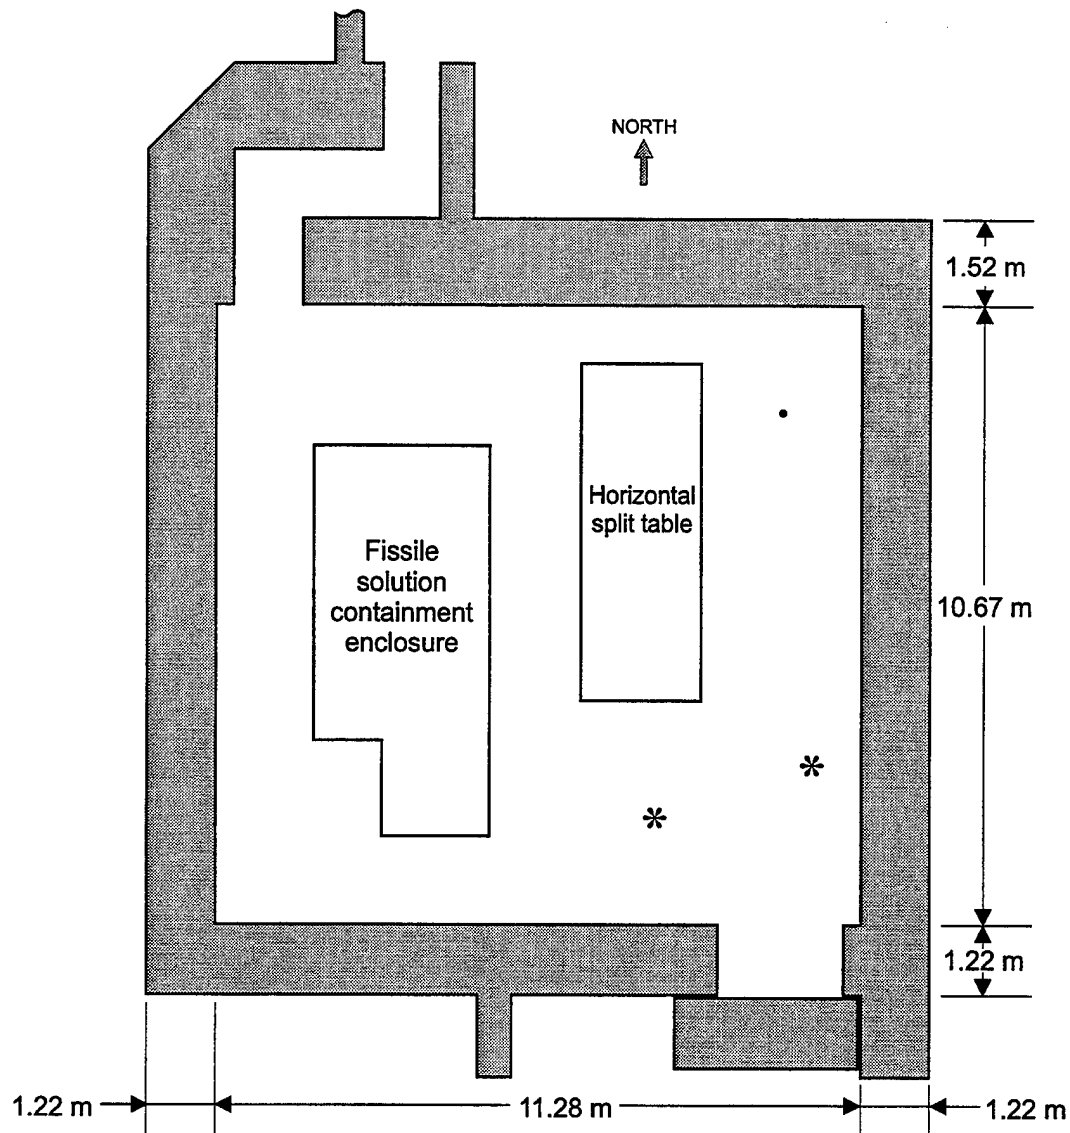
The thick-walled concrete room in which experiments were performed was called the “Assembly Room”. The rosette close to the east wall approximately locates the centers of assemblies built on the heavyweight table. The other rosette provides a similar location for the lightweight table. The dot in the northeast corner pertains to Figure 13.
